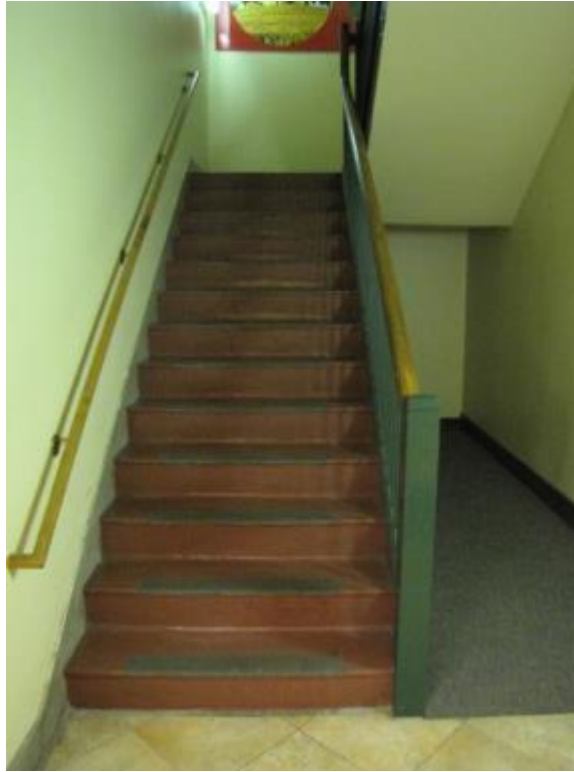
Site B – View of Stairwell Up to Second Floor
